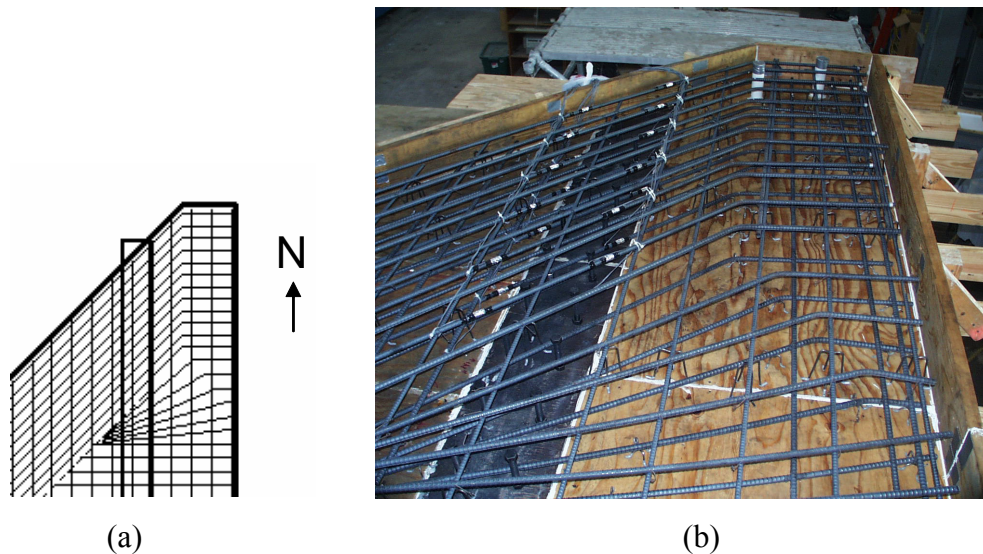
UTSE overhang reinforcement, top and bottom mats: (a) plan view drawing; (b) picture
